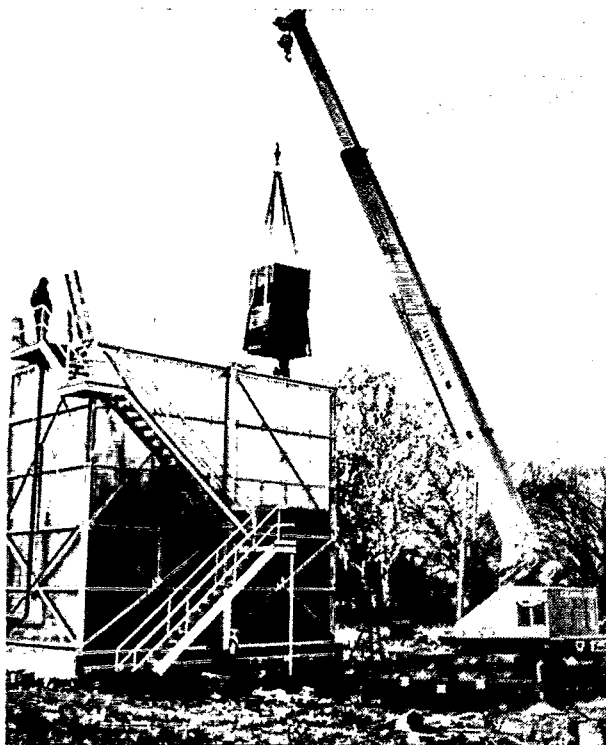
Corrugated PVC used for trickling filter walls. Shown here is a rectangular filter with media being installed (photograph courtesy B. F. Goodrich).
